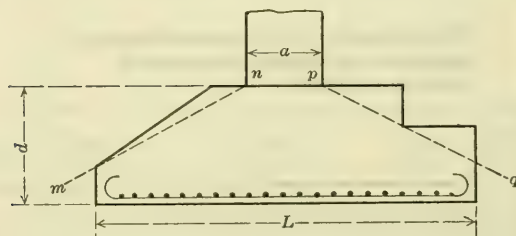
TYPICAL SLOPED OR STEPPED FOOTING.
